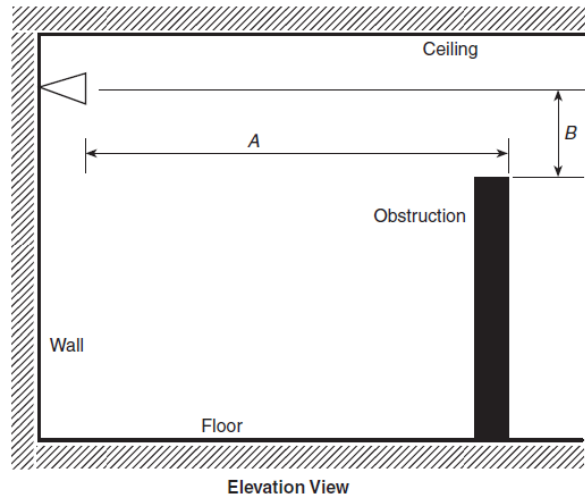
Suspended or Floor-Mounted Obstruction (Standard Sidewall Spray Sprinklers) in Light Hazard Occupancy Only.
